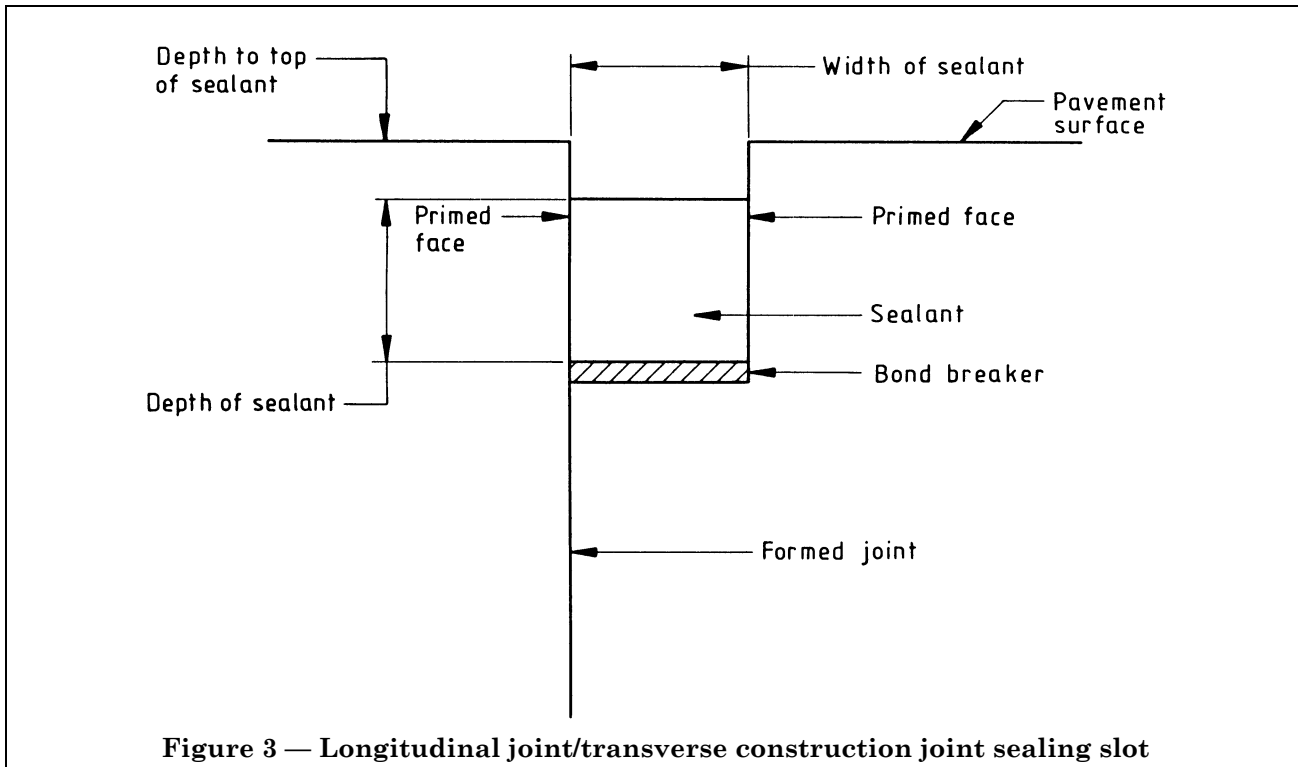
Longitudinal joint/transverse construction joint sealing slot
